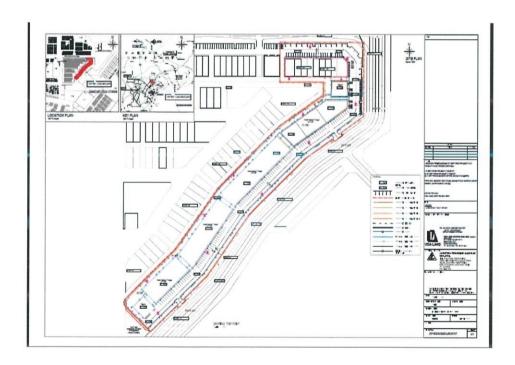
Shows the coring point throughout the construction site for Coring Test
